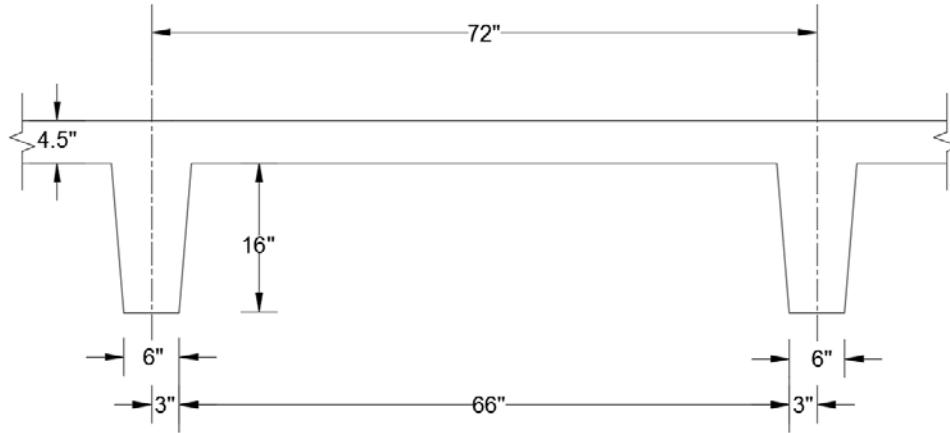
One-way Joist Concrete Floor Framing System (Elevation)
